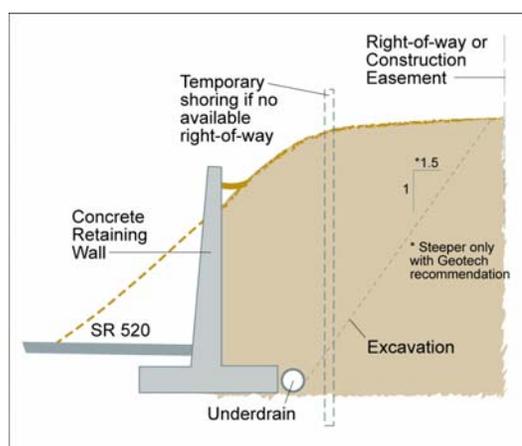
Typical Concrete Wall in a Cut Slope.
